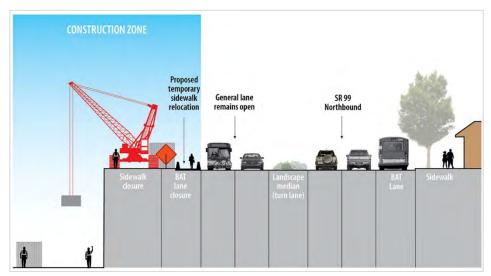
Construction of Trench Guideway on Side of SR 99
